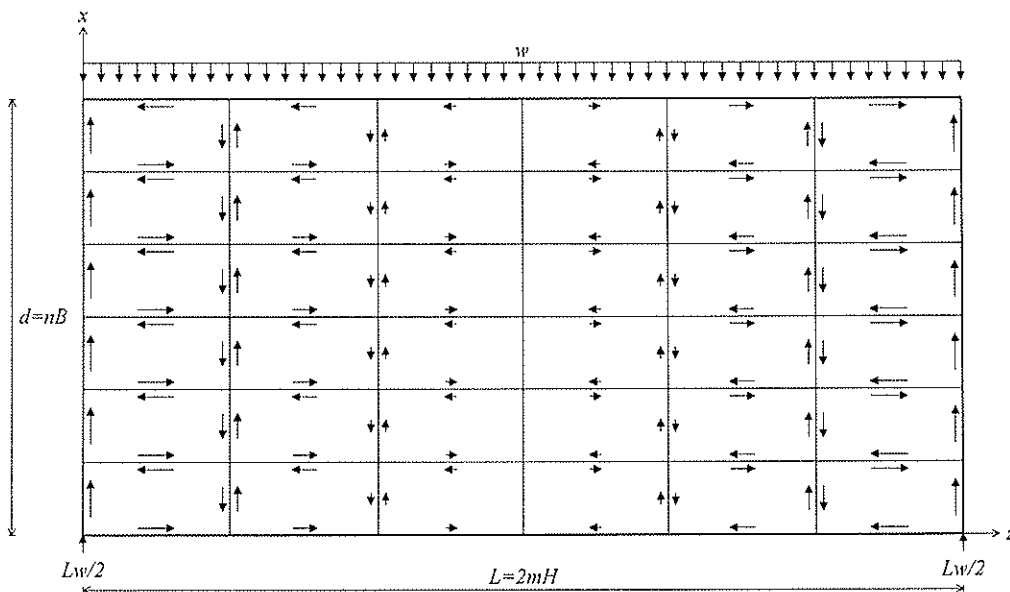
Shear force distribution of a ceiling or floor diaphragm
